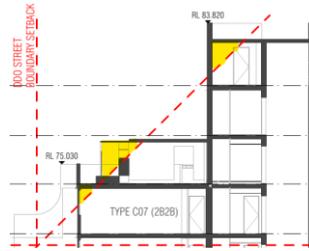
Excerpt of Site Section A (area of encroachment to Building 1 highlighted) (Fieldwork)
